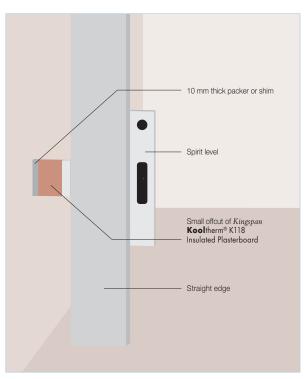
Setting out to install *Kingspan* Kooltherm® K118 Insulated Plasterboard
